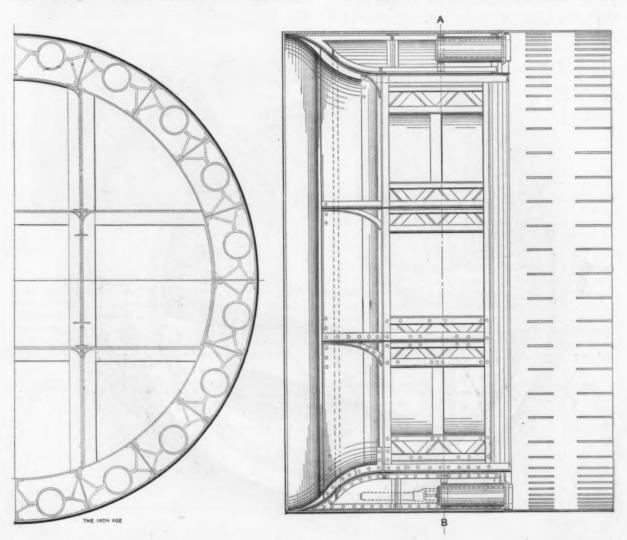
Half Transverse Section and Longitudinal Section of the Hastings Tunneling Shield.
